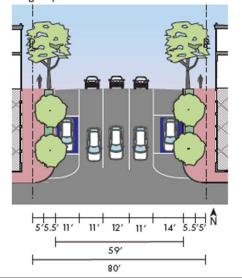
The North Beach Master Plan identified one-way streets as an issue.
